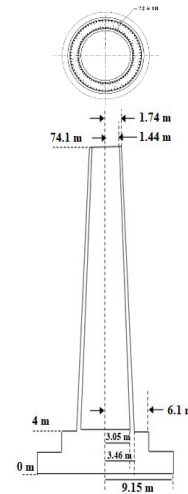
Two-dimensional cross-section and plan of the Briones dam intake tower
